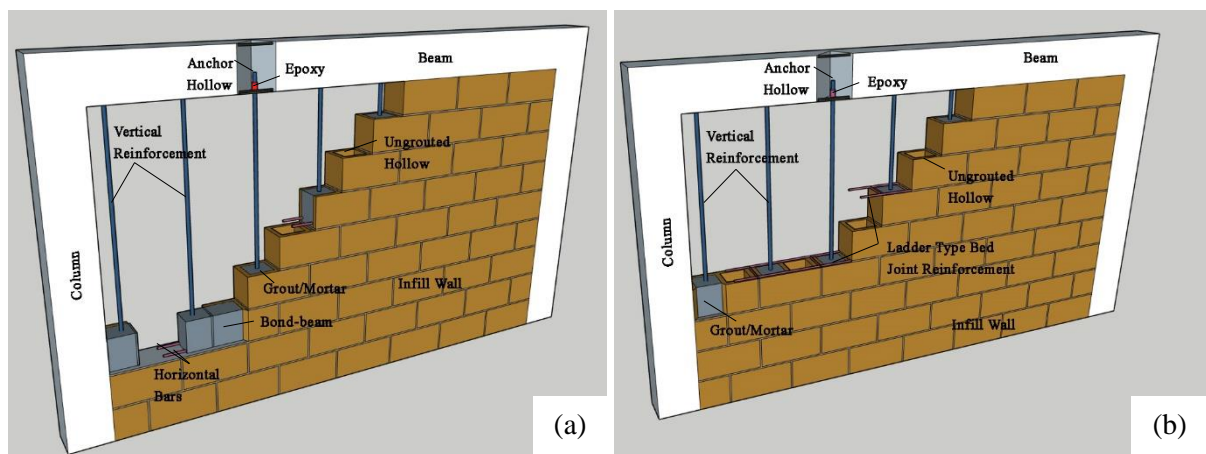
An example of a wall produced in (a) BB and (b) BJR types
